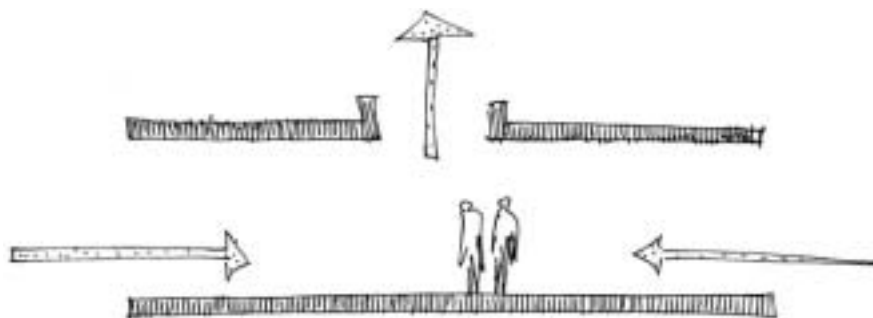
Sketch of stack ventilation. As a rule of thumb, stack ventilation is effective across a width of 5 times the floor to ceiling height from the inlet to where the air is exhausted¹.
